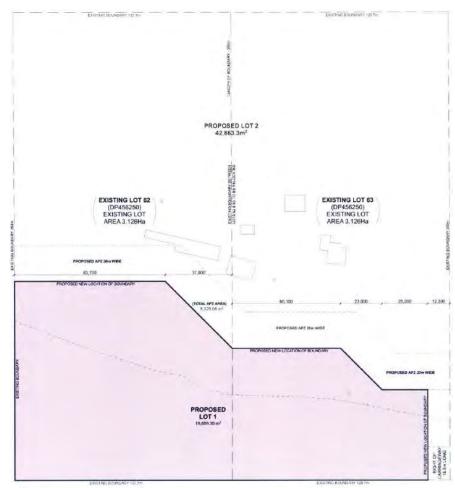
Proposed 2 lot subdivision (boundary adjustment)
